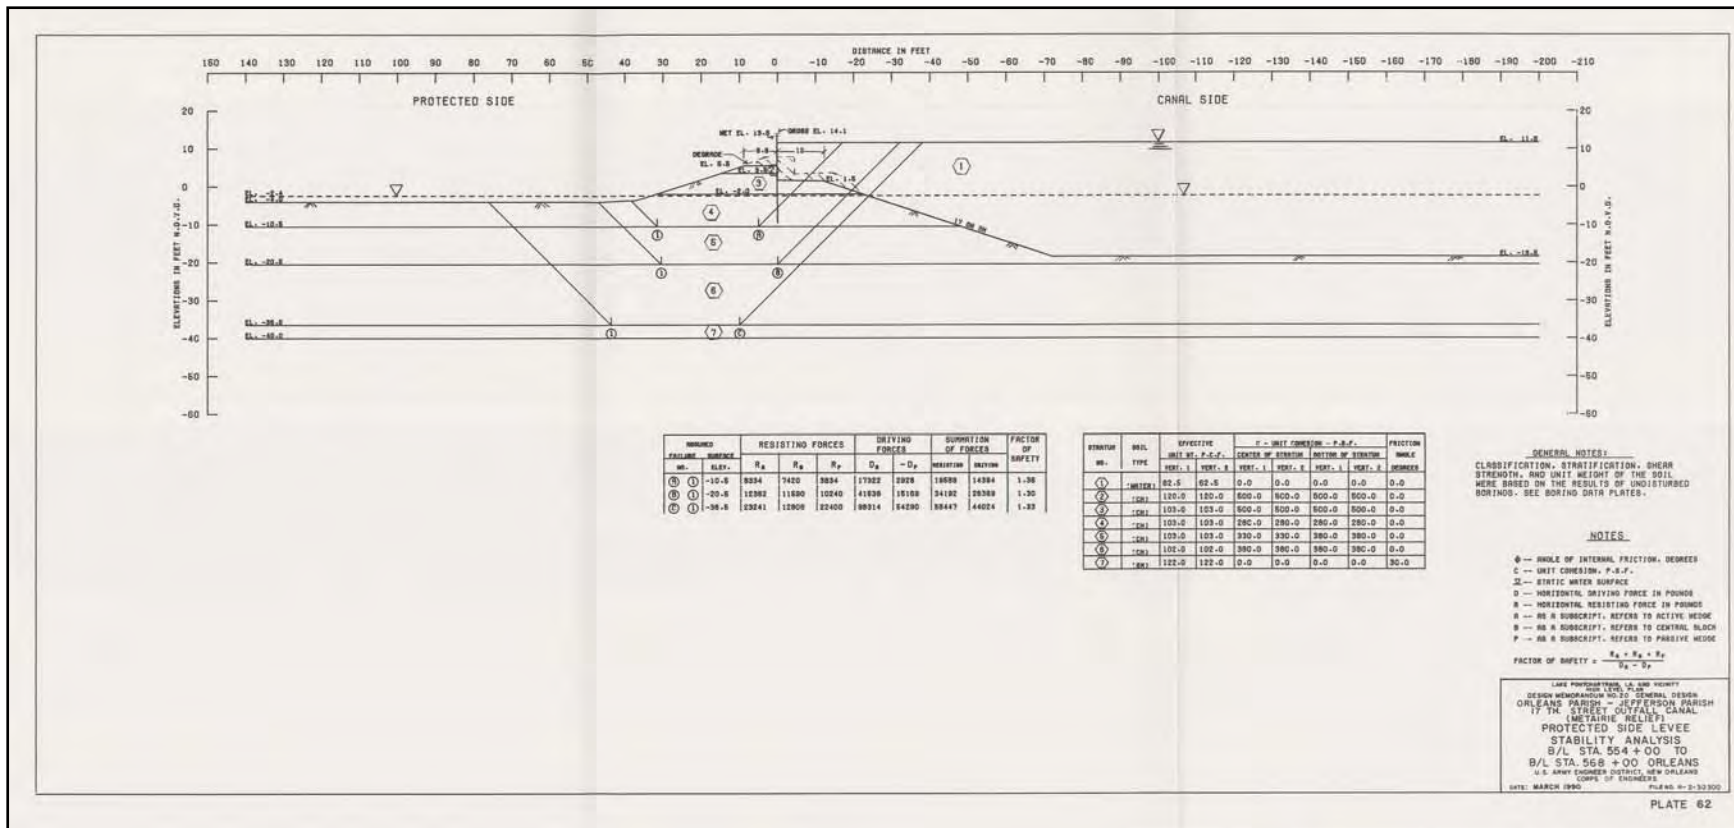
Design Cross Section, from GDM 20, Plate 62
